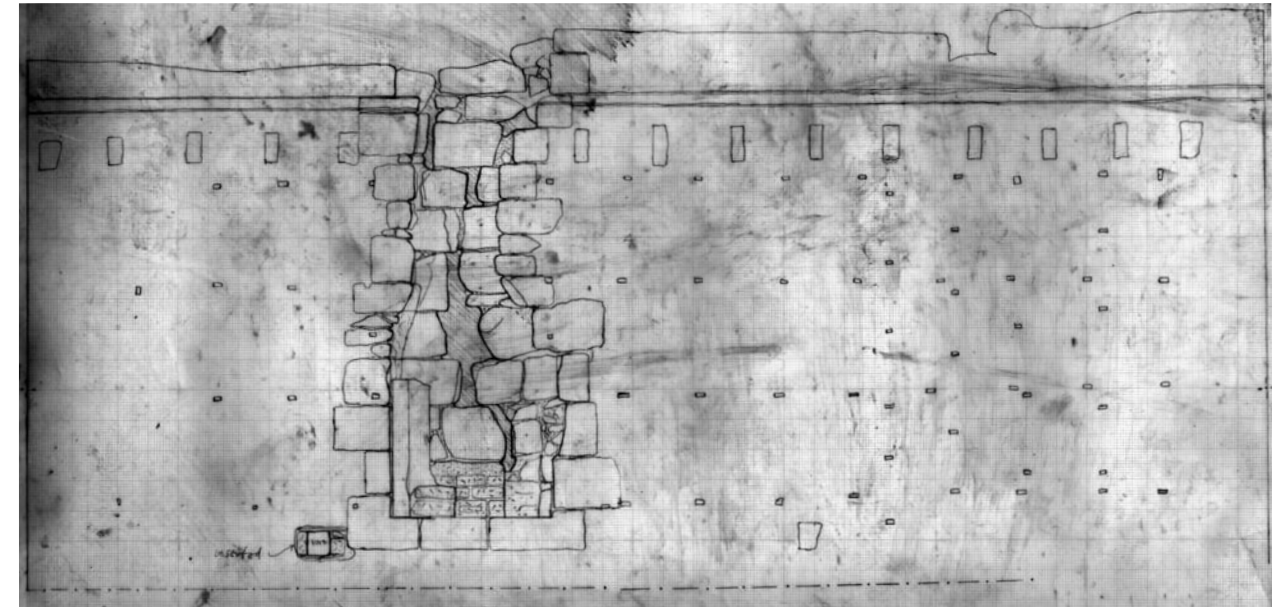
S facing internal elevation of Western Chamber - Drawing No.010
